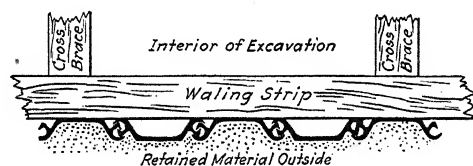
Typical section of wall of Lackawanna arched web steel sheet piling showing interior bracing.
